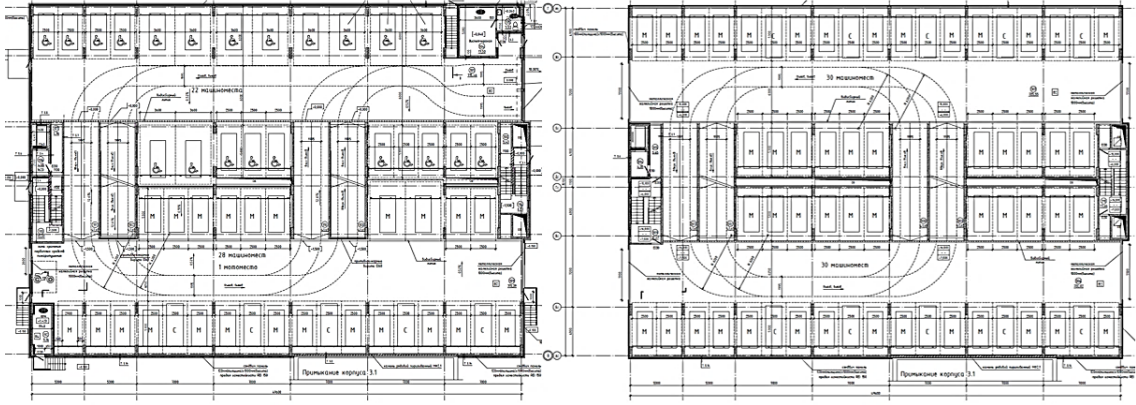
1st floor and typical floor plans of the Tarmo parking
